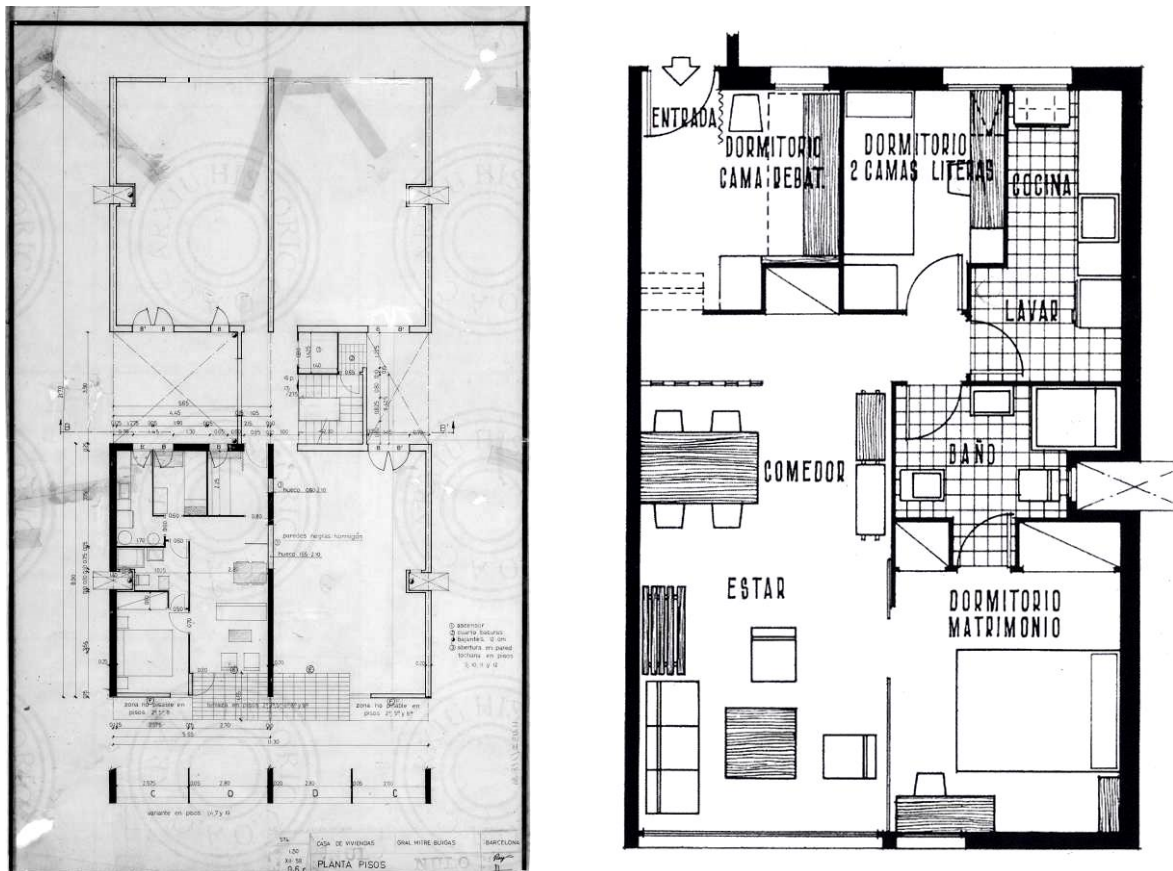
F. Barba Corsini Mitre Building, Barcelona. H Shaped module plan and apartment for a four-member family. Source: COAC Archive.
